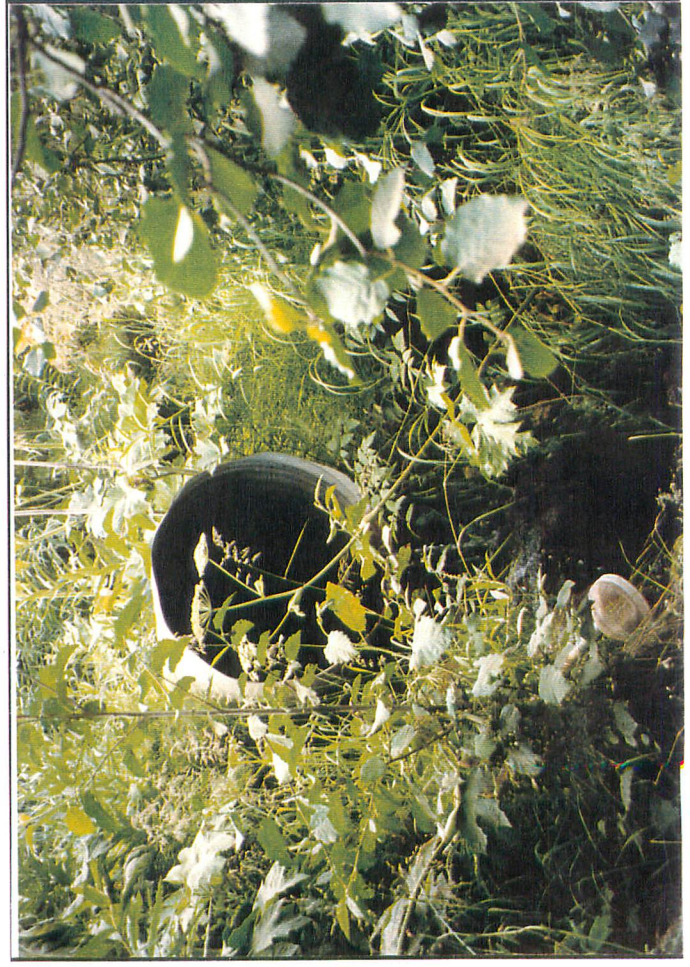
Owen Lake Trib. OW25, R1, Site 74 - Road Culvert
